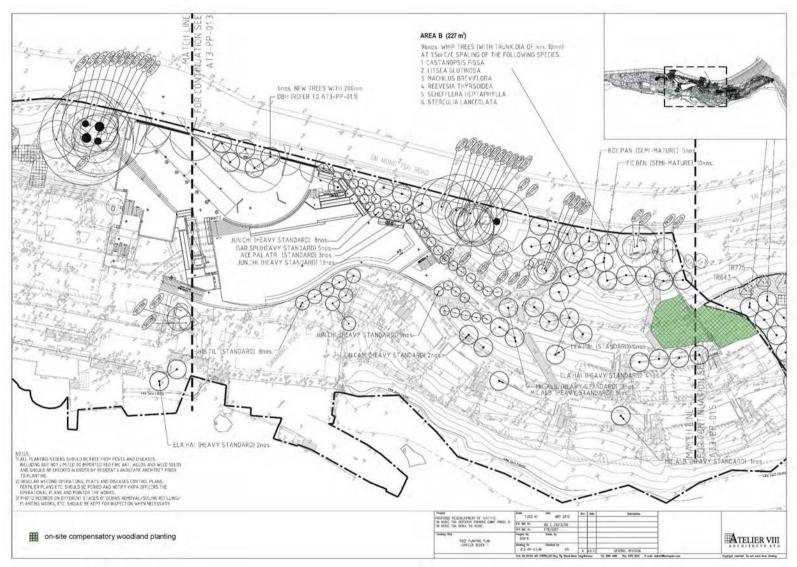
On-Site Compensatory Woodland Planting Plan - Schedule of Drawings (cont.)
